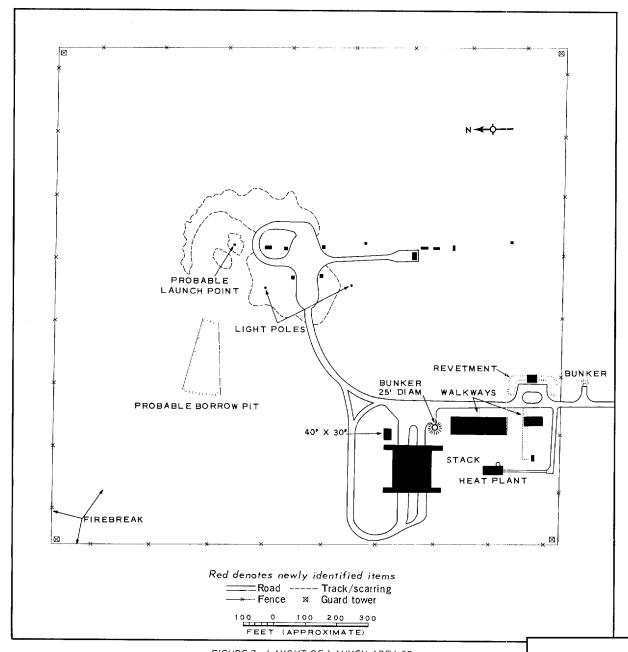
, LAYOUT OF LAUNCH AREA 3D.
